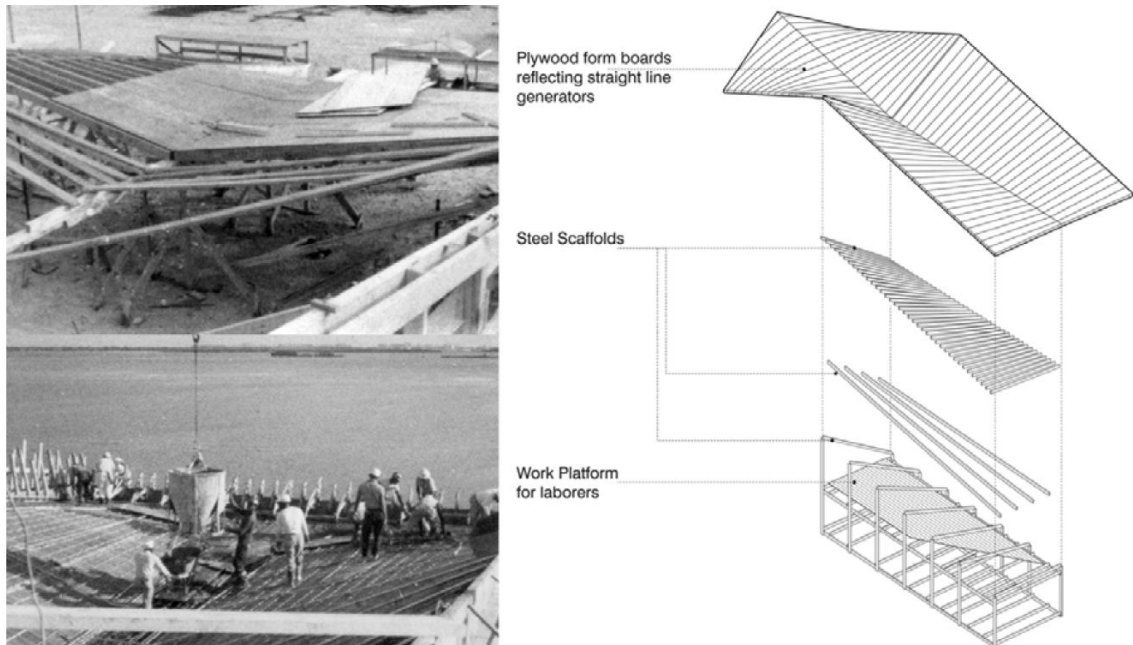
An example of hypar shell construction given by the Miami Marine Stadium. Images courtesy of Sigrid Adriaenssens.
